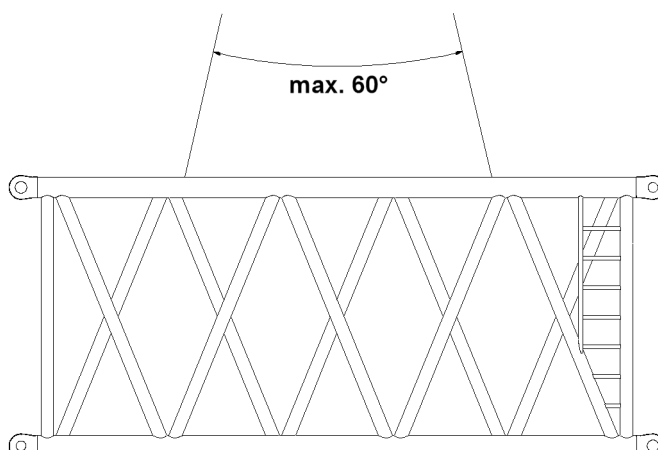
Fastening equipment, spreading angle maximum 60°
